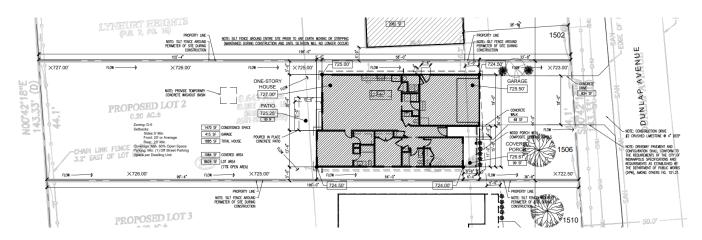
1506 Dunlap Avenue enlarged site plan.
